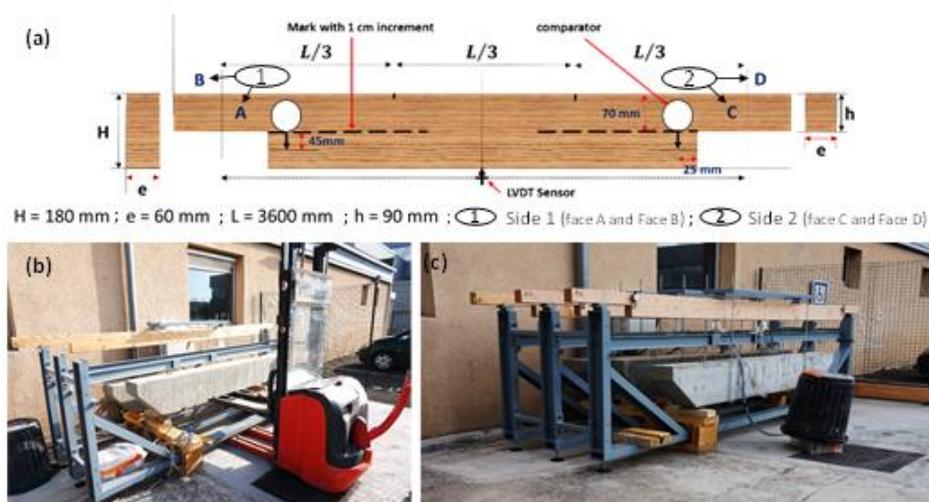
(a) type of specimen used; (b) application of concrete blocks; (c) specimens in creep tests.
